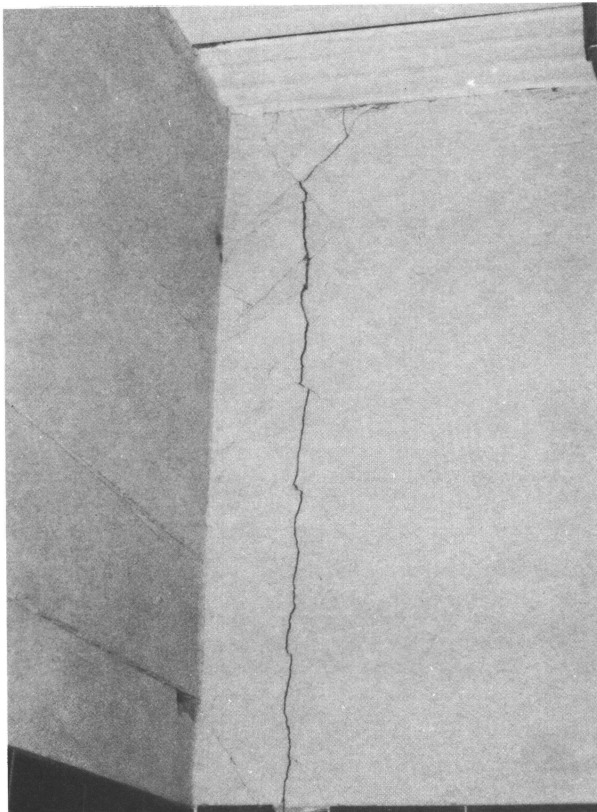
Vertical and diagonal cracking on the first floor of Wallerawang Power Station.
